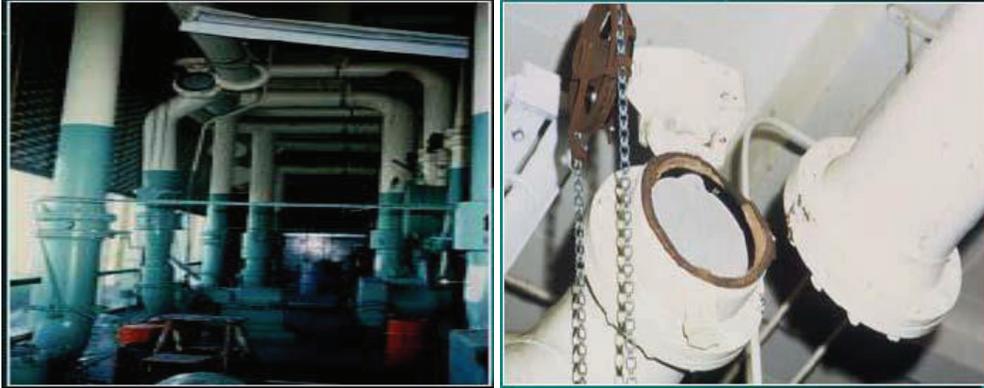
Failures of central plant pipe and valve to piping connection (Gates, 2005)
